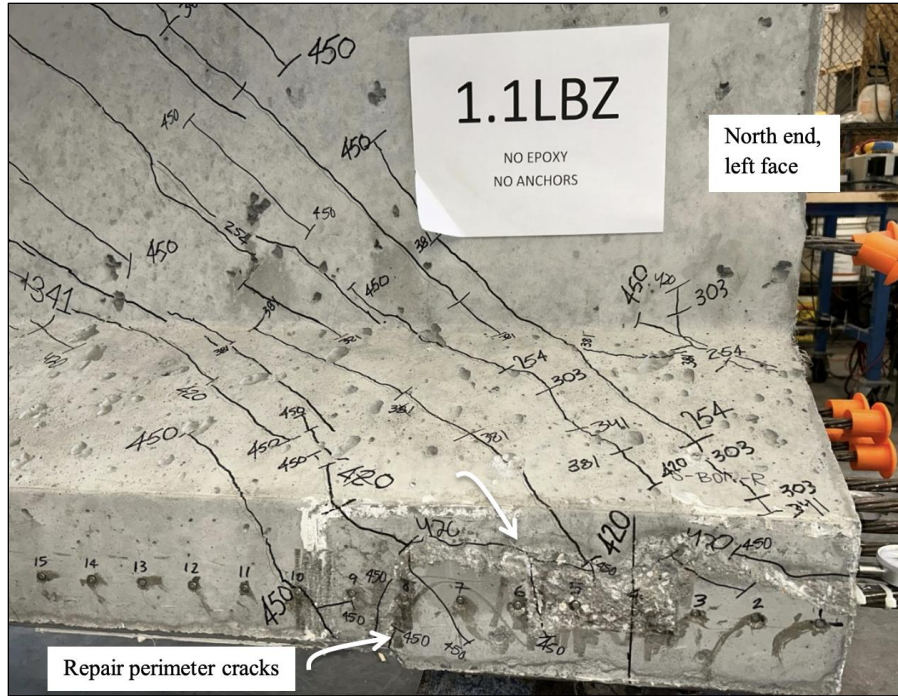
Photo. Test 1.1.S (repair 1.1LBZ) bearing cracks on bulb surface and around perimeter of repair 1.1LBZ at 450 kip (left face of girder pictured).
